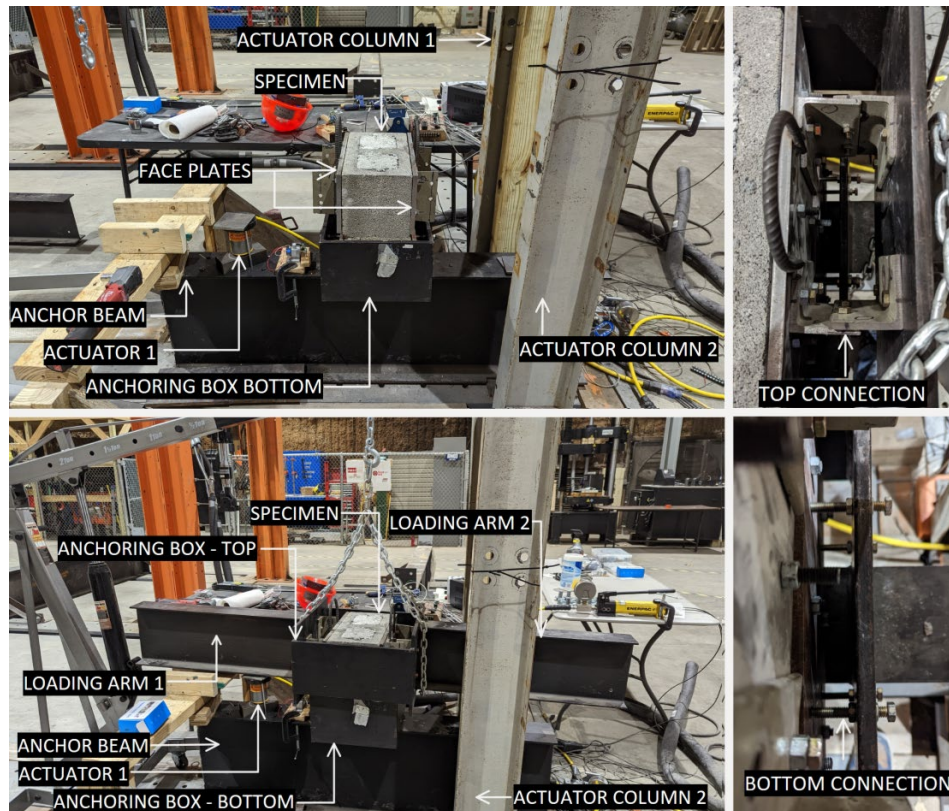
Demonstration of Specimen Placement and Connection from Masonry to the Loading Arm [38]
